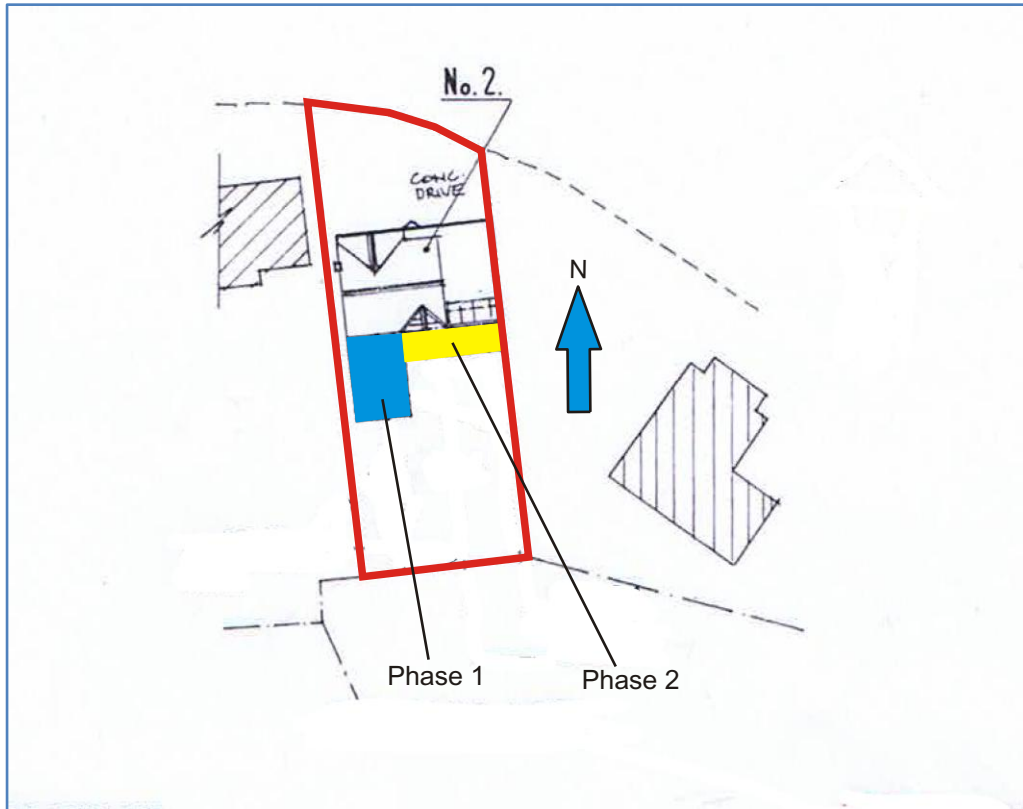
Block plan showing the proposed site layout & Phase 1 & Phase 2 rear extensions at an original scale of 1:500, (extract from Architects plan)
